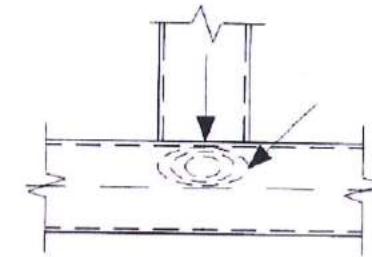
The chord side wall failure as one examined failure mode
